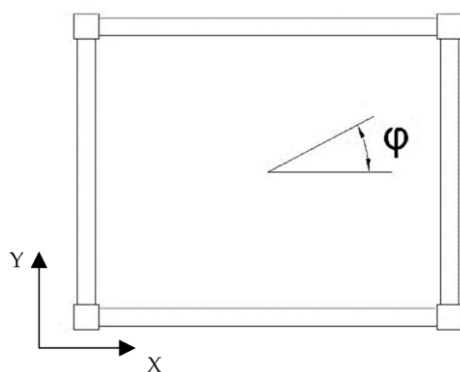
Floor plan of the 3D buildings with earthquake incidence angle “ φ ”.
